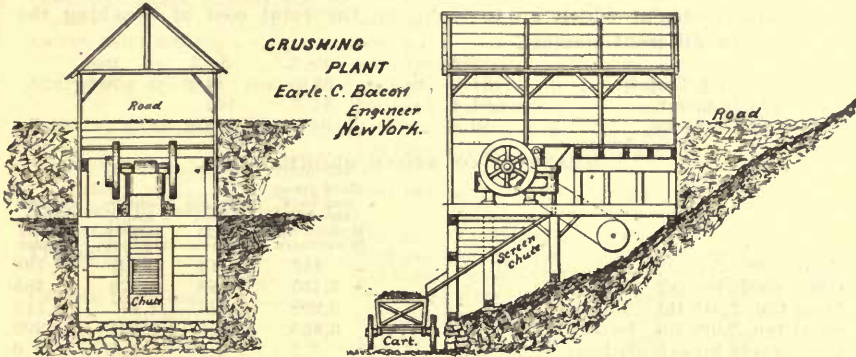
General arrangement of a crushing plant on sidehill location.
